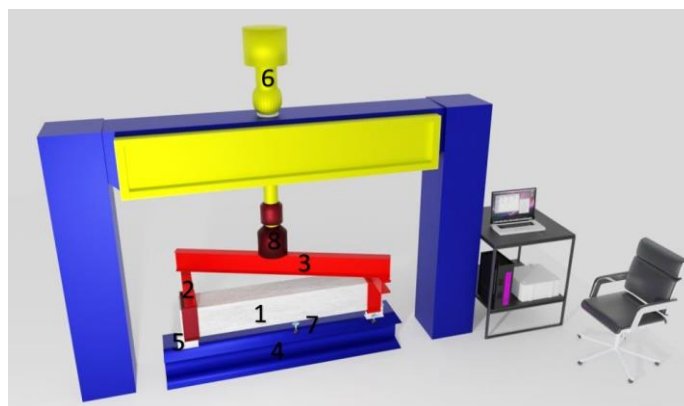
Setup for testing beam specimens, 1. Sample from a beam. 2. Loading Arm. 3. WF-sec for a steel beam., 4. the primary bed area. 5. Support that can be rotated in any direction. 6. A hydraulic jack. 7. A gauge with a dial. 8. A bob of the head.
